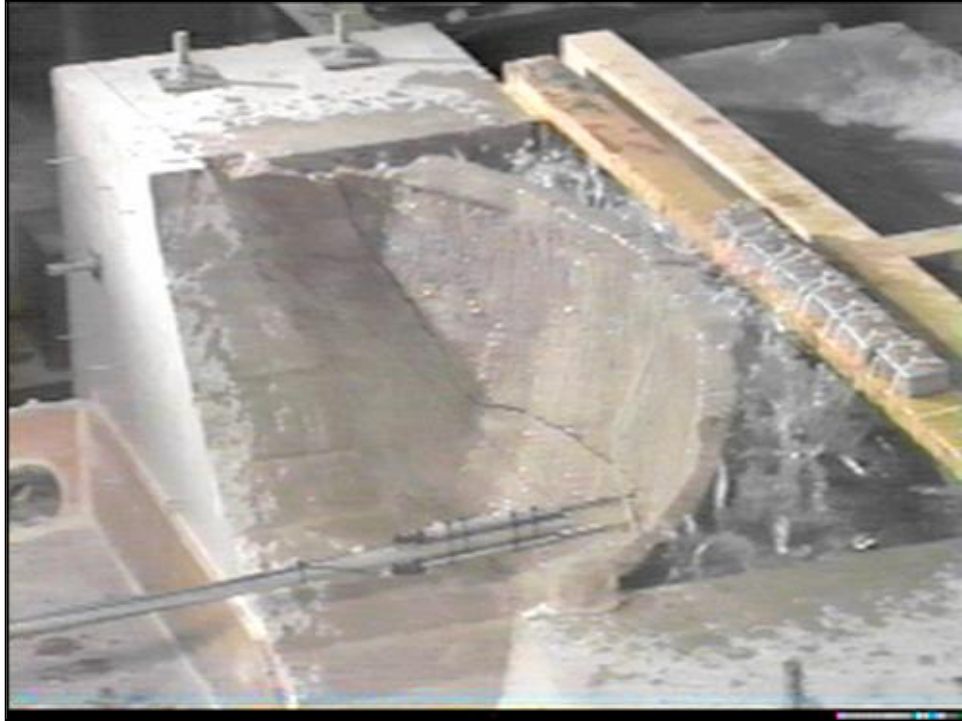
Model 10—horizontal joint north view, initial cracking.
